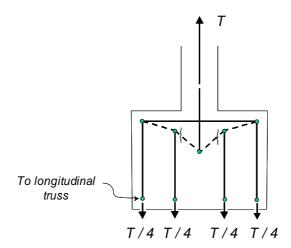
Strut-and-tie model showing the internal force flow of a wall embedded in the foundation beam
